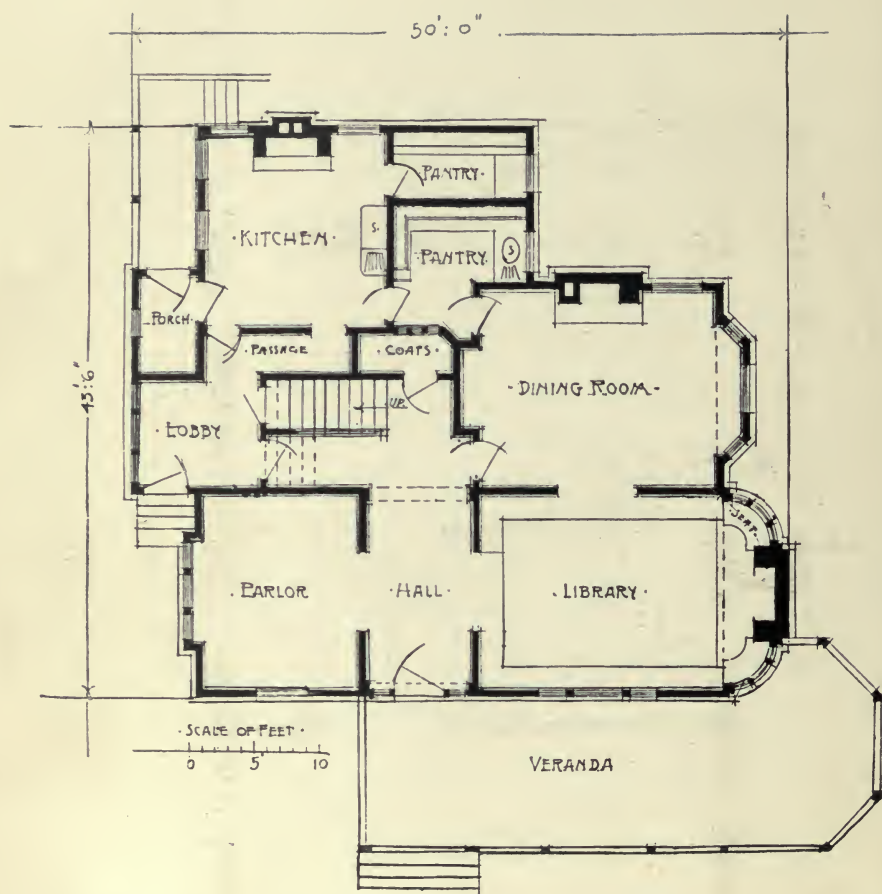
We show in this diagram the plan of a larger house than that on the preceding page. The parlor in this plan serves the purpose of a reception-room. The plan is compact and workable.
